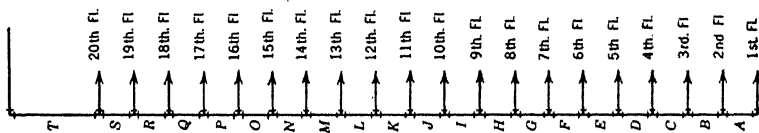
TYPICAL RISER FOR 20-STORY BUILDING
